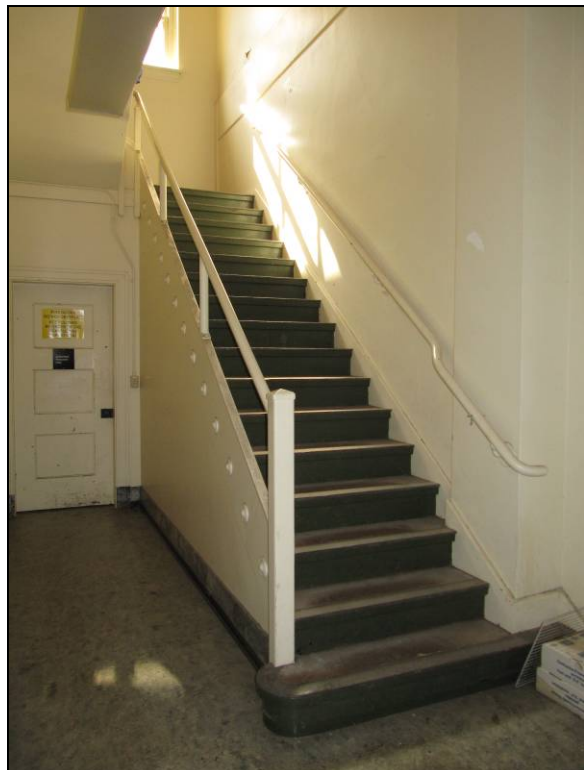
Top left, upper floor southeast corner. Figure 58. Top right, second floor interior.
